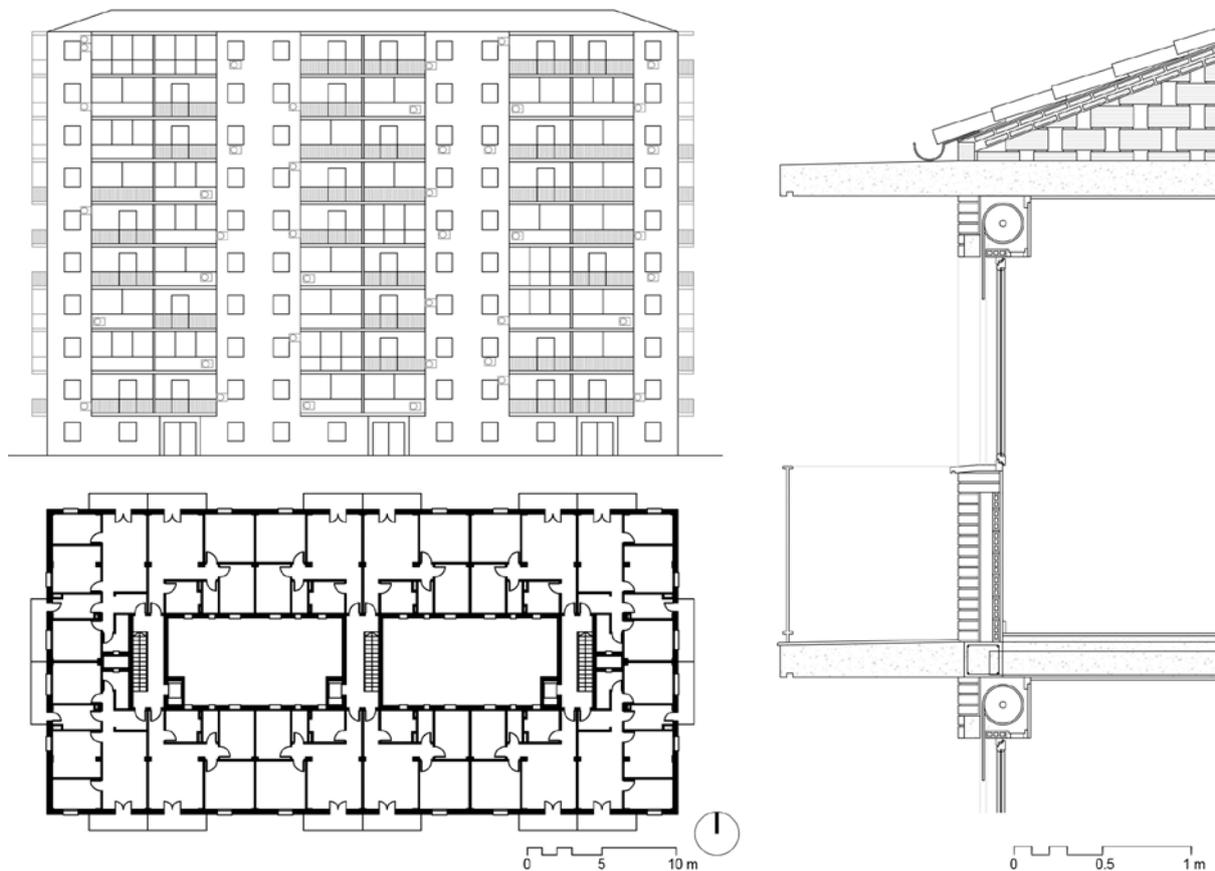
Layout of the existing building: elevation, floor plan and vertical section of the top floor [2].
